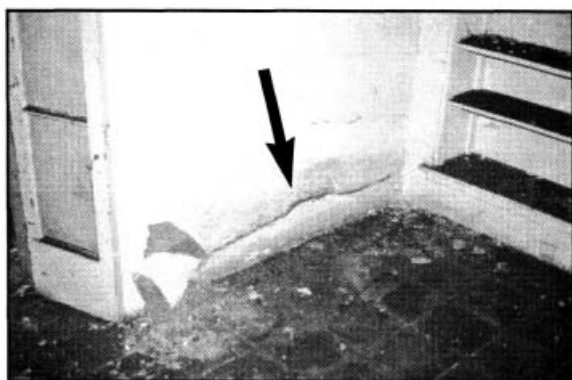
Spalling of adobe and plaster at the base of the east wall. The adobe has been severely weakened by previous wet/dry cycles.
